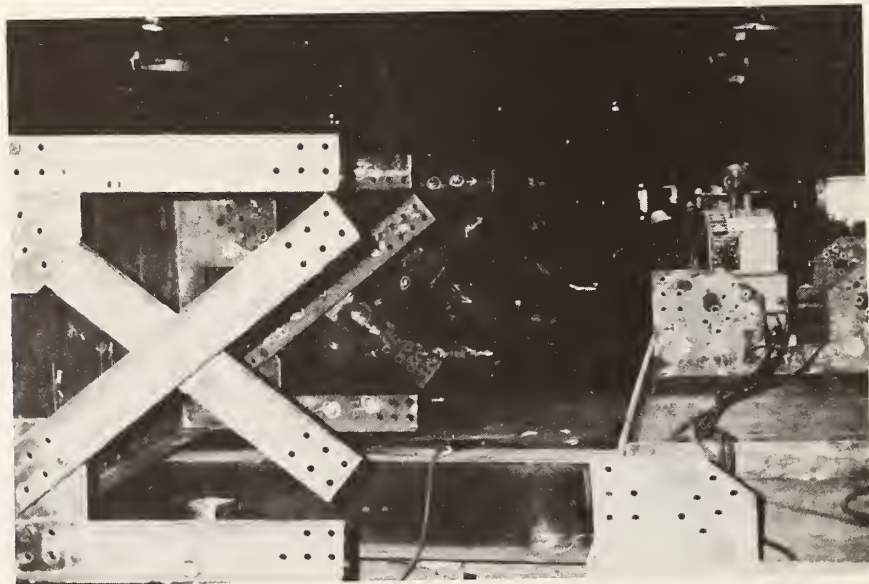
Diaphragms Connecting Girders of Assembly 1
